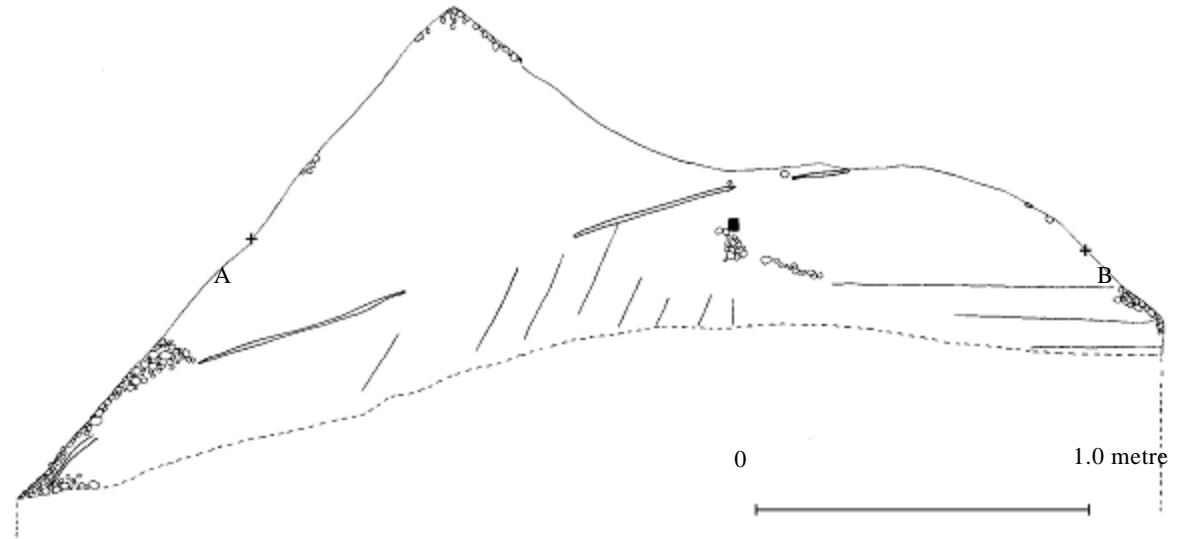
West facing elevation of Air Raid Shelter at St Luke's.
